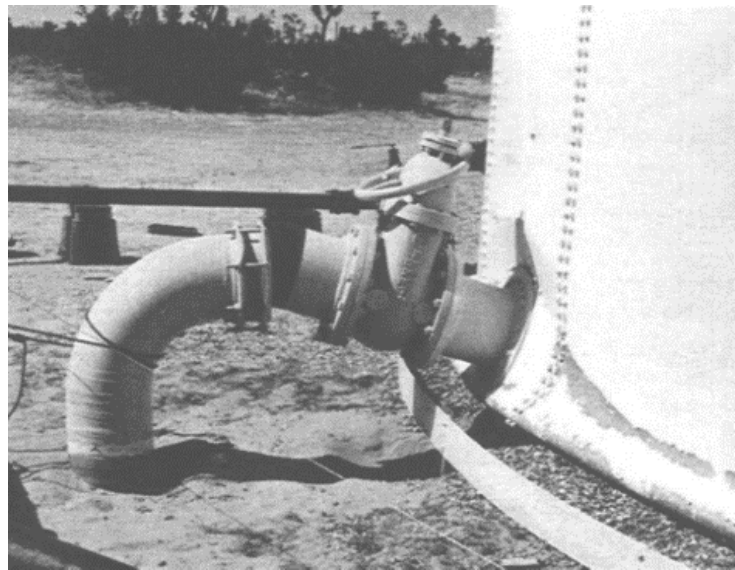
Rigid pipe connection, 1992 Landers earthquake (NZSEE, 2009)
